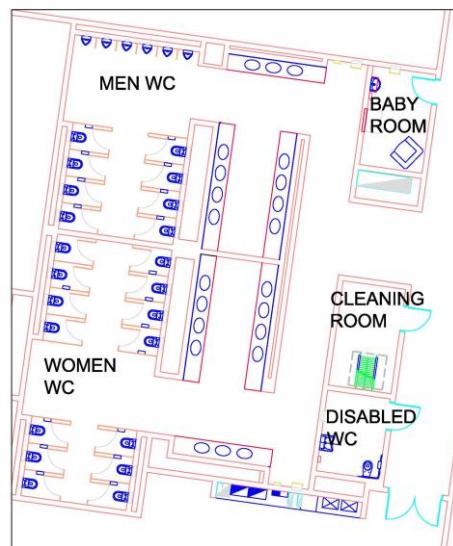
Plan of the rest room in first floor at Forum Ankara.
